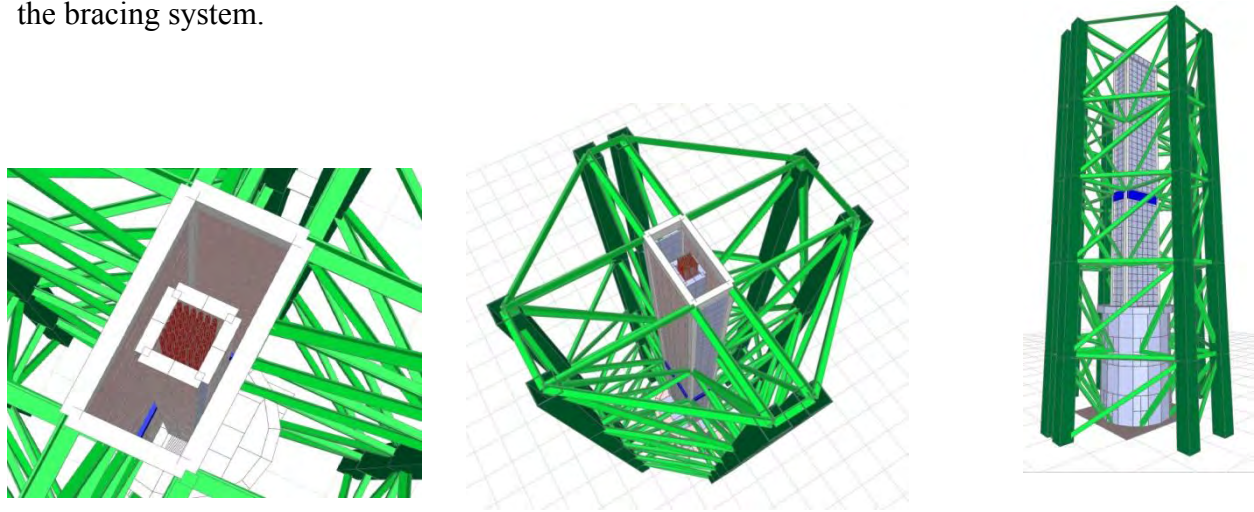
Finite element of the fuel assembly and its supporting structure.
